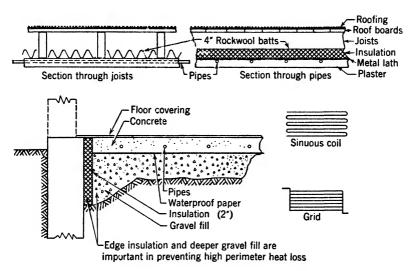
Typical ceiling and floor installations of radiant pipe coils.
